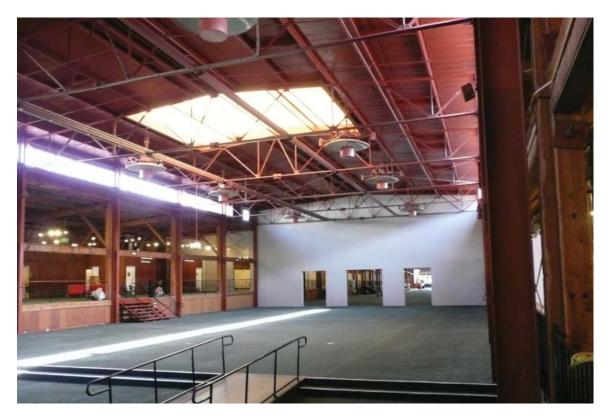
Wall dividing center, 1980s section (ARG September 2009).
